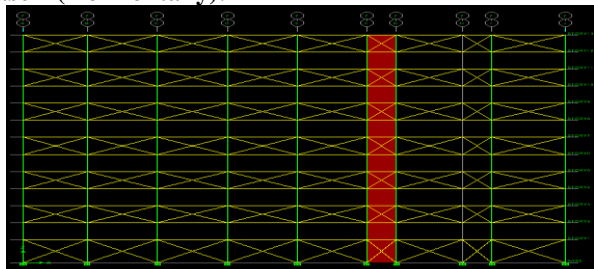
Elevation view of building with alternate bracings. (Horizontally from 1bay).
